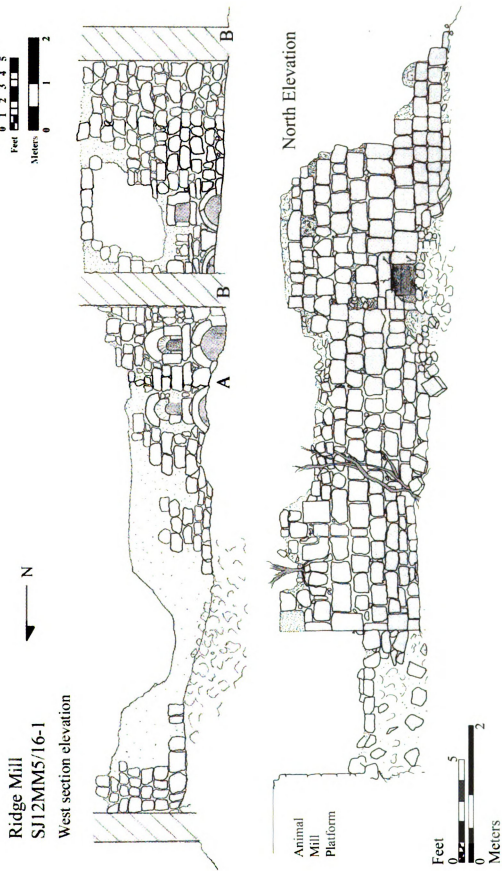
and 11. Ridge mill complex, north wall. The space between the mill platform and the curing facility once was spanned by a gate or door. Iron hinge pin are extant in the stonework of the building. Stacked stone barrier in the space currently is relatively recent.
